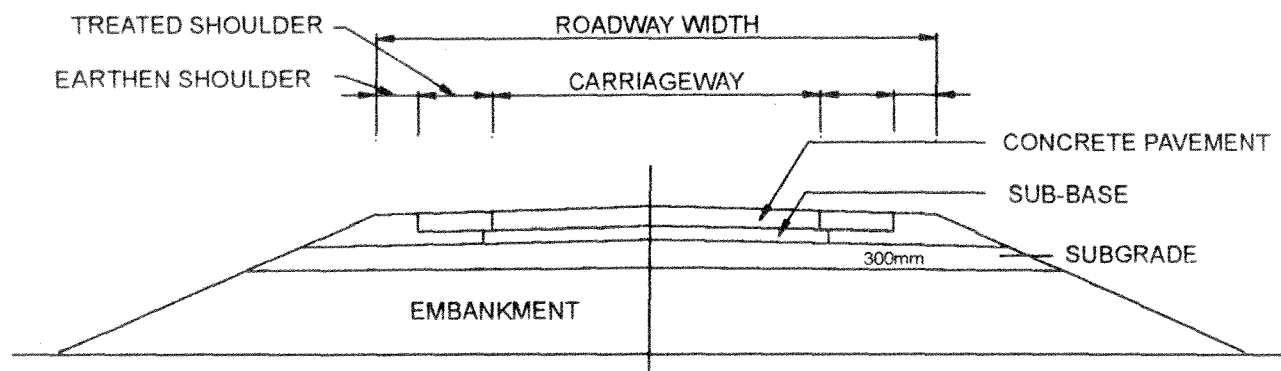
Terms Used in the Specification to Describe Road Cross-Section Elements with a Cement Concrete Pavement
